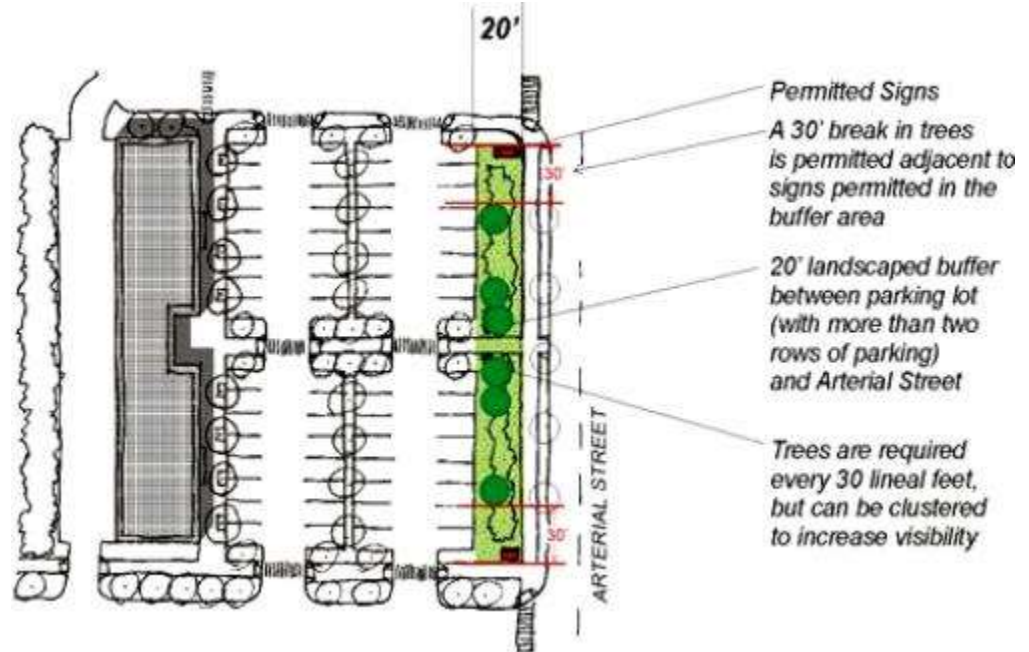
Landscaping between large parking lots and adjacent streets.
